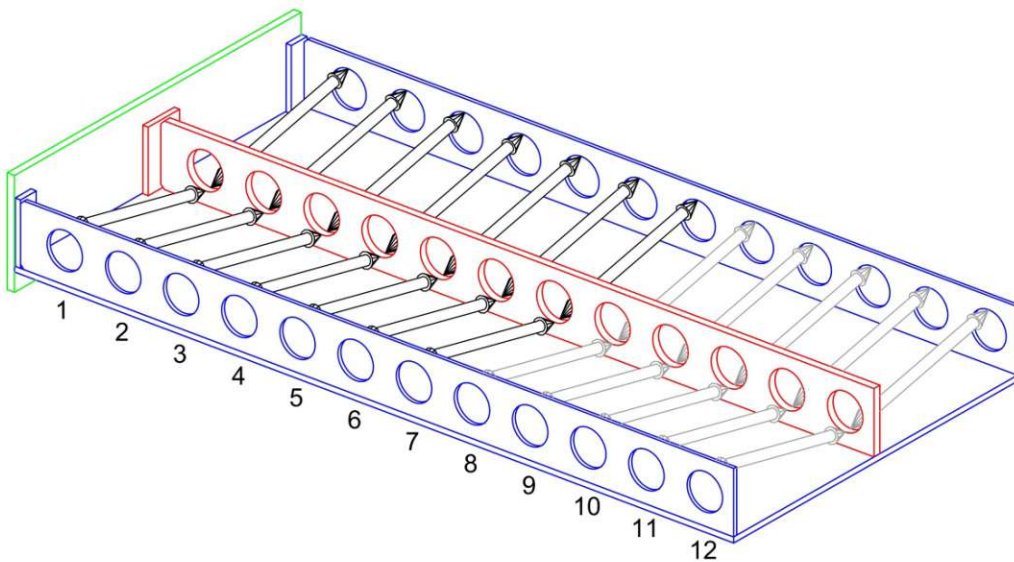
Concrete model with coupling members: the black and grey concrete struts symbolise the force transfer between the shear connectors to prevent the differences between the deflections of the steel sections
